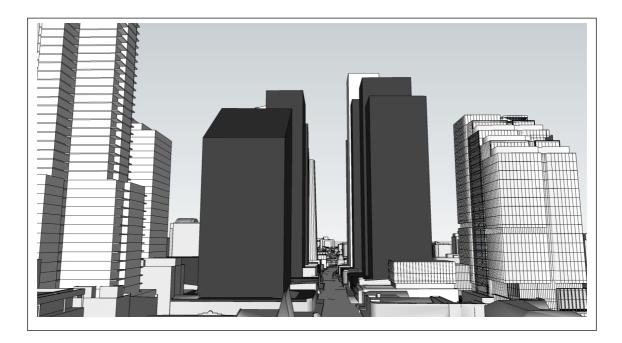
10m upper level (tower) setback - looking north towards the River
